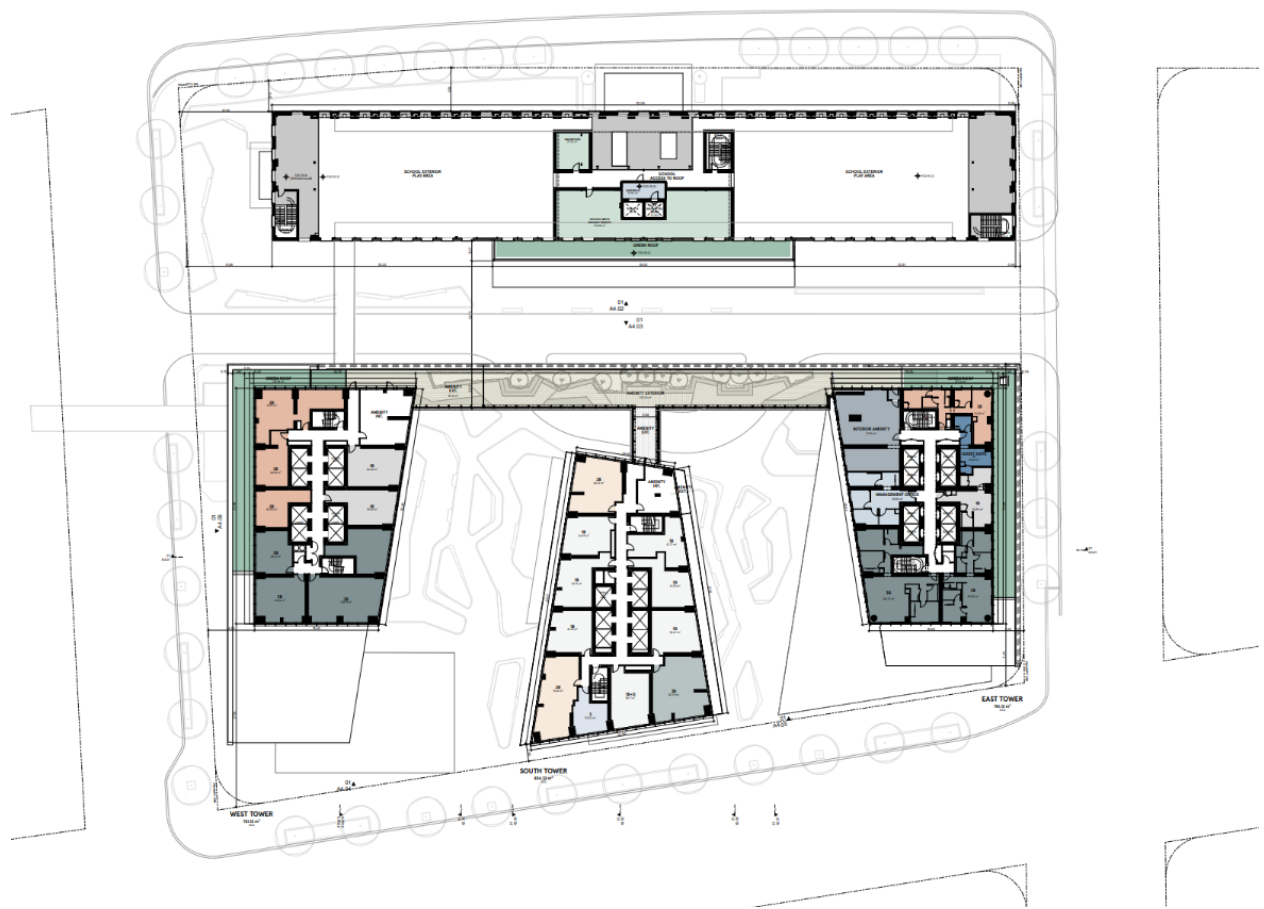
Level 4 floor plan for 55 Lake Shore Boulevard East included for illustration purposes (architectsAlliance, February 14, 2026).
